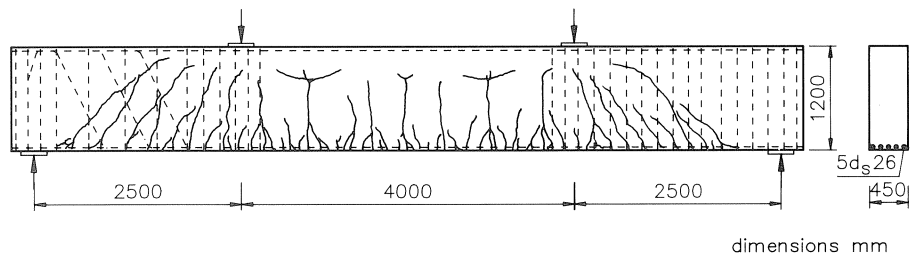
Crack pattern of a deep reinforced concrete beam [Rehm and Rüschi, 1963a].
